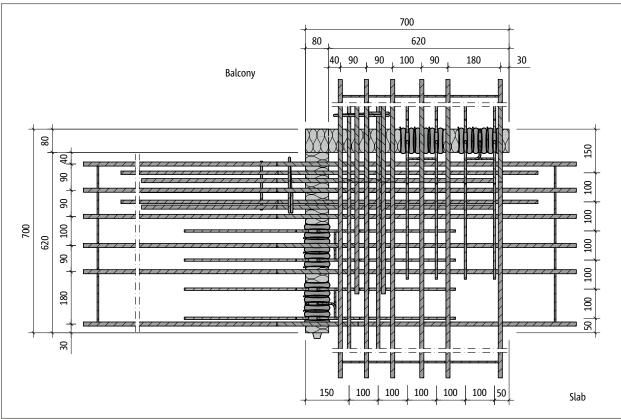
Schöck Isokorb® T type C-M2: Product layout
